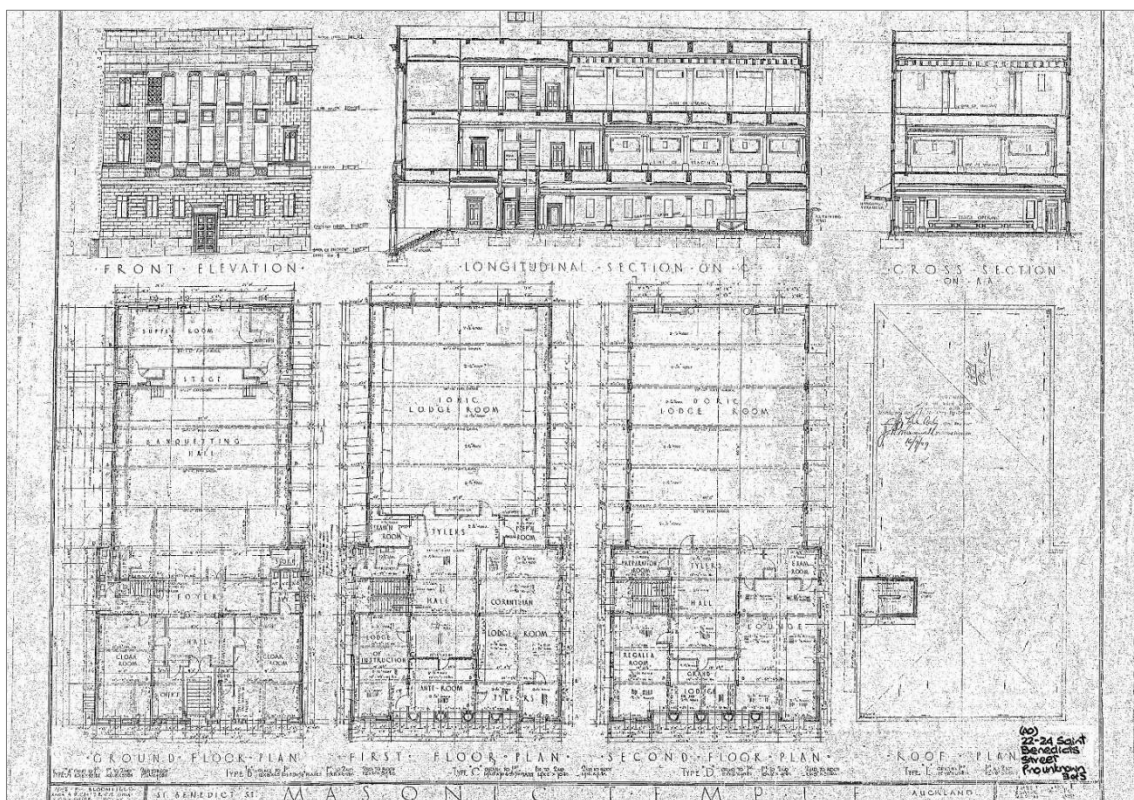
1929 Drawings for 'MASONIC TEMPLE' - by W. S. R. Bloomfield, Architect: Floor and Roof Plans, Front Elevation and Cross Sections. Auckland Council Property File. Accessed March 2022
